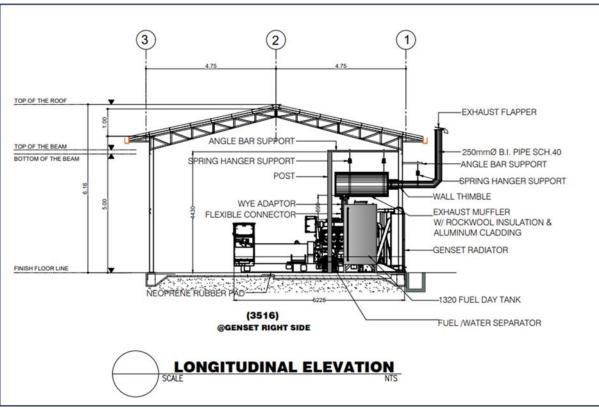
Elevation drawing of the powerhouse and stack of the proposed gensets.
